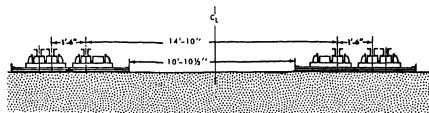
Lateral spacing of plain rollers for triple-truss and multistory Bailey bridges.
